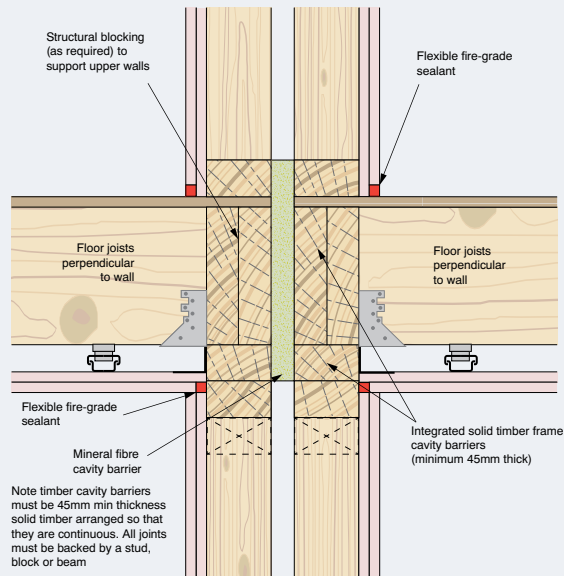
Fire-protected timber frame wall /floor junction with integral cavity barriers – beams perpendicular to wall Class 2 building.
